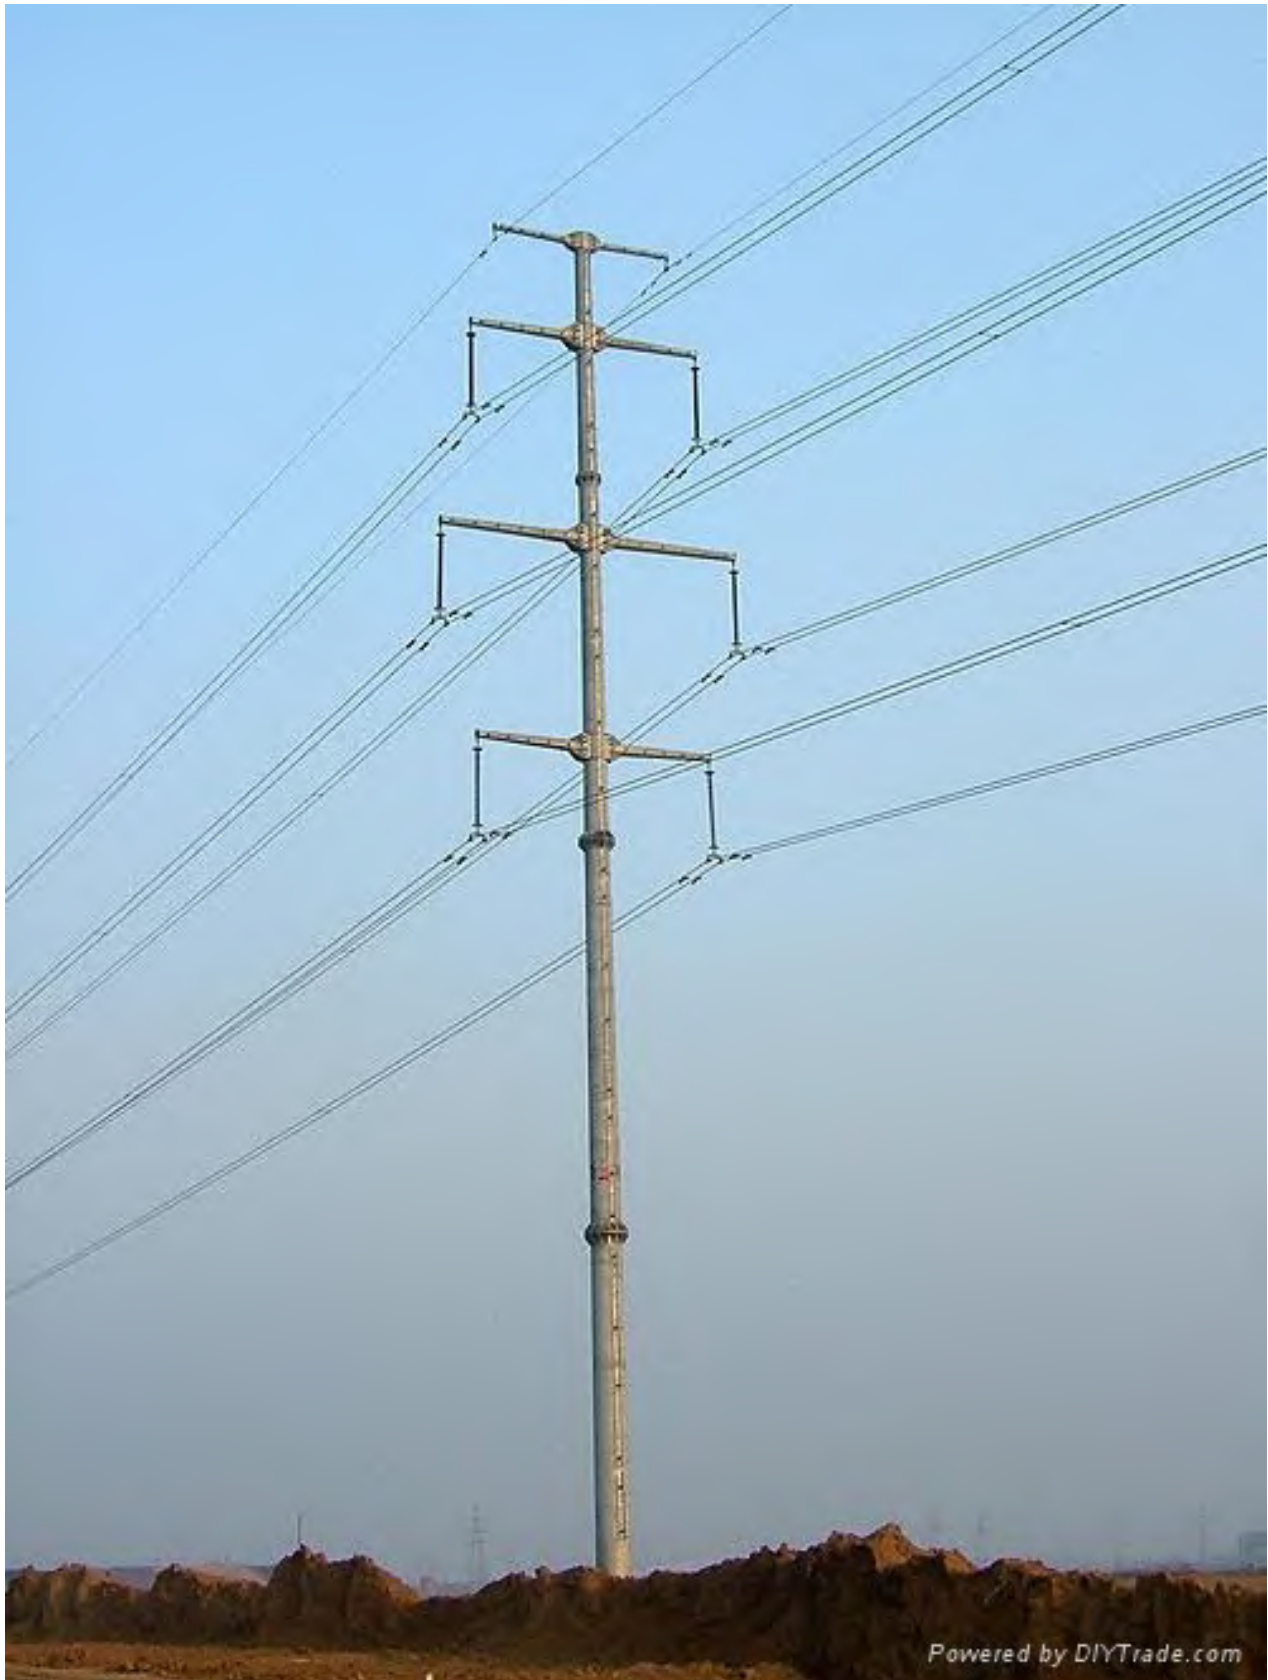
TYPICAL STEEL MONOPOLE TOWER
